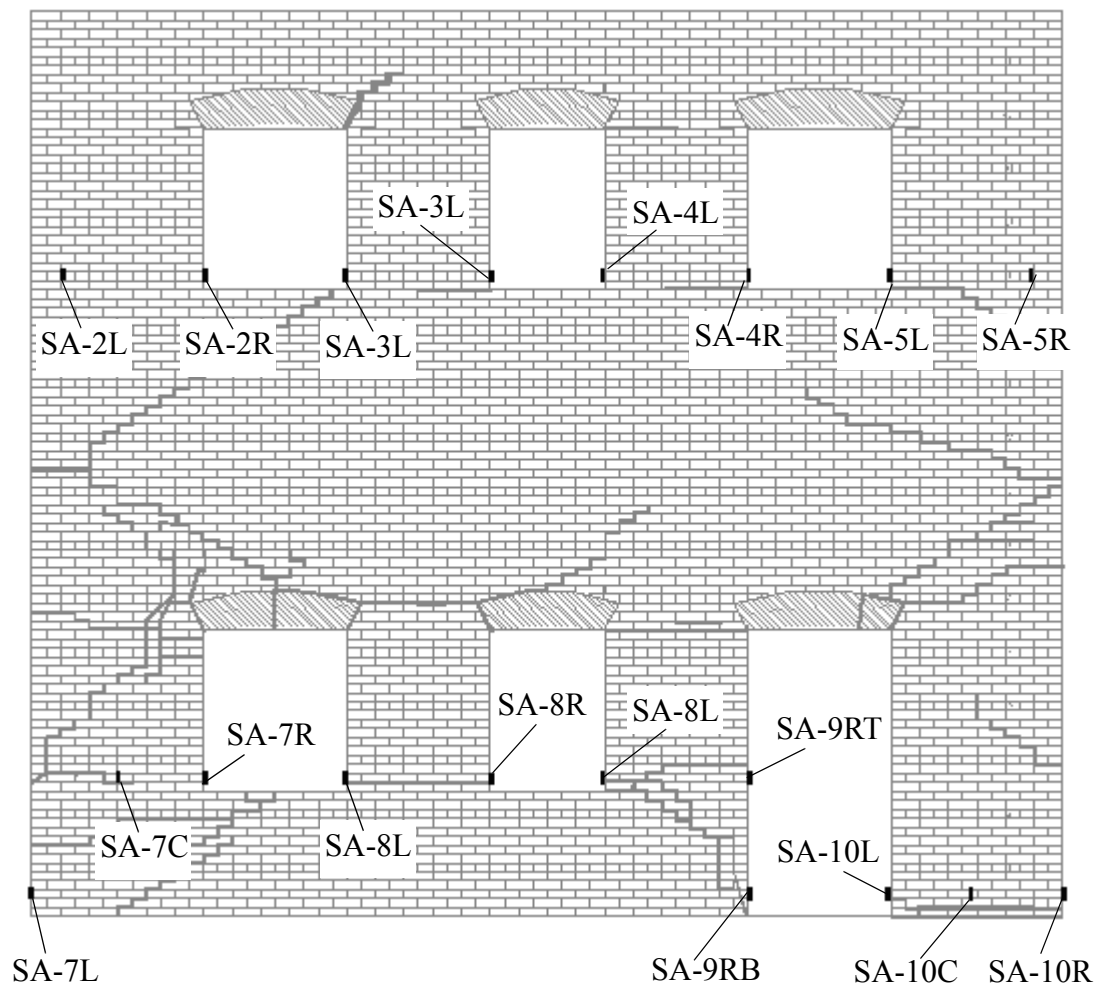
Elevation of Wall A illustrating the location of strain gages.
